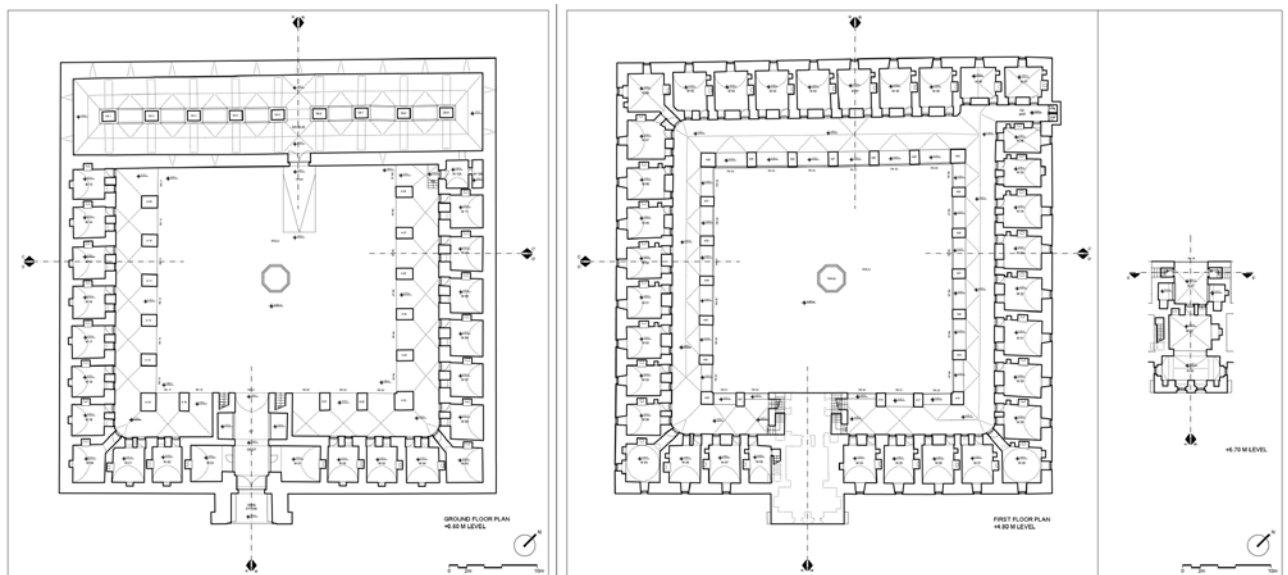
Reconstitution of the ground floor and first floor plans of the han.
